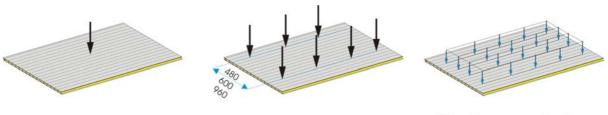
1 - geometrical details of the test specimens. Dimensions in mm.
